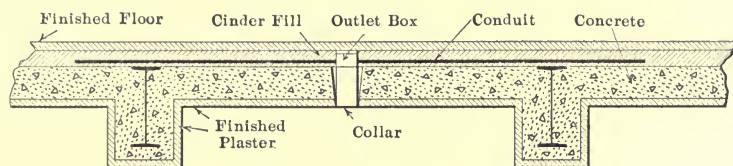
METHOD OF BRINGING OUTLET TO CEILING LEVEL.
